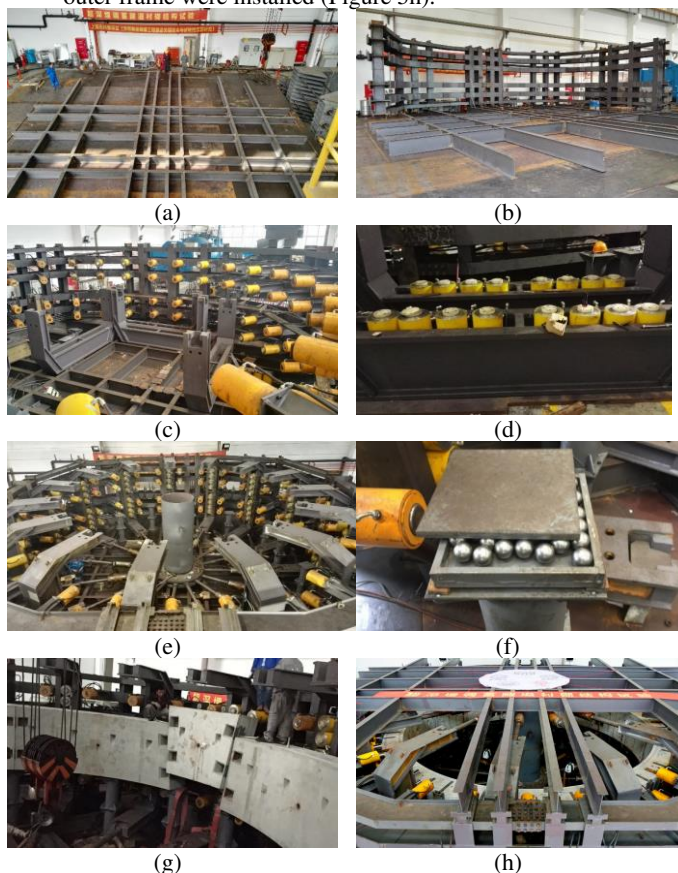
Assembly process of the loading frame and the segments in the single-ring loading tests.
